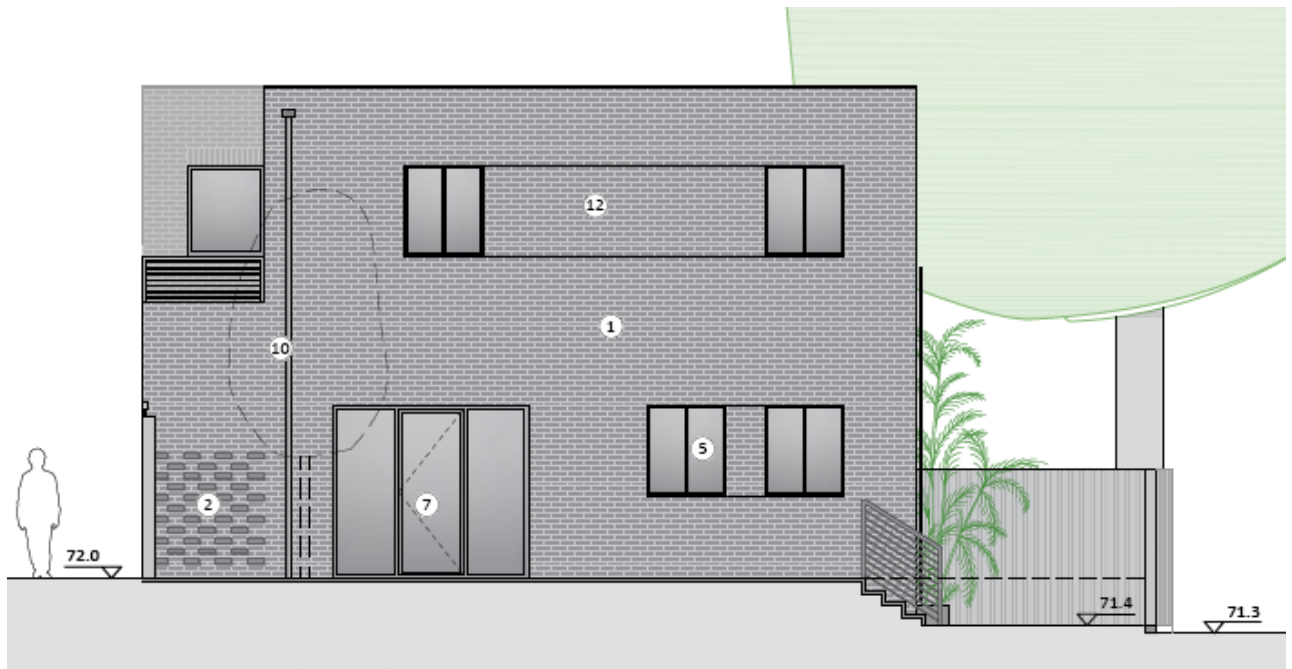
Refused side elevation of planning application 16/00018/FUL.
